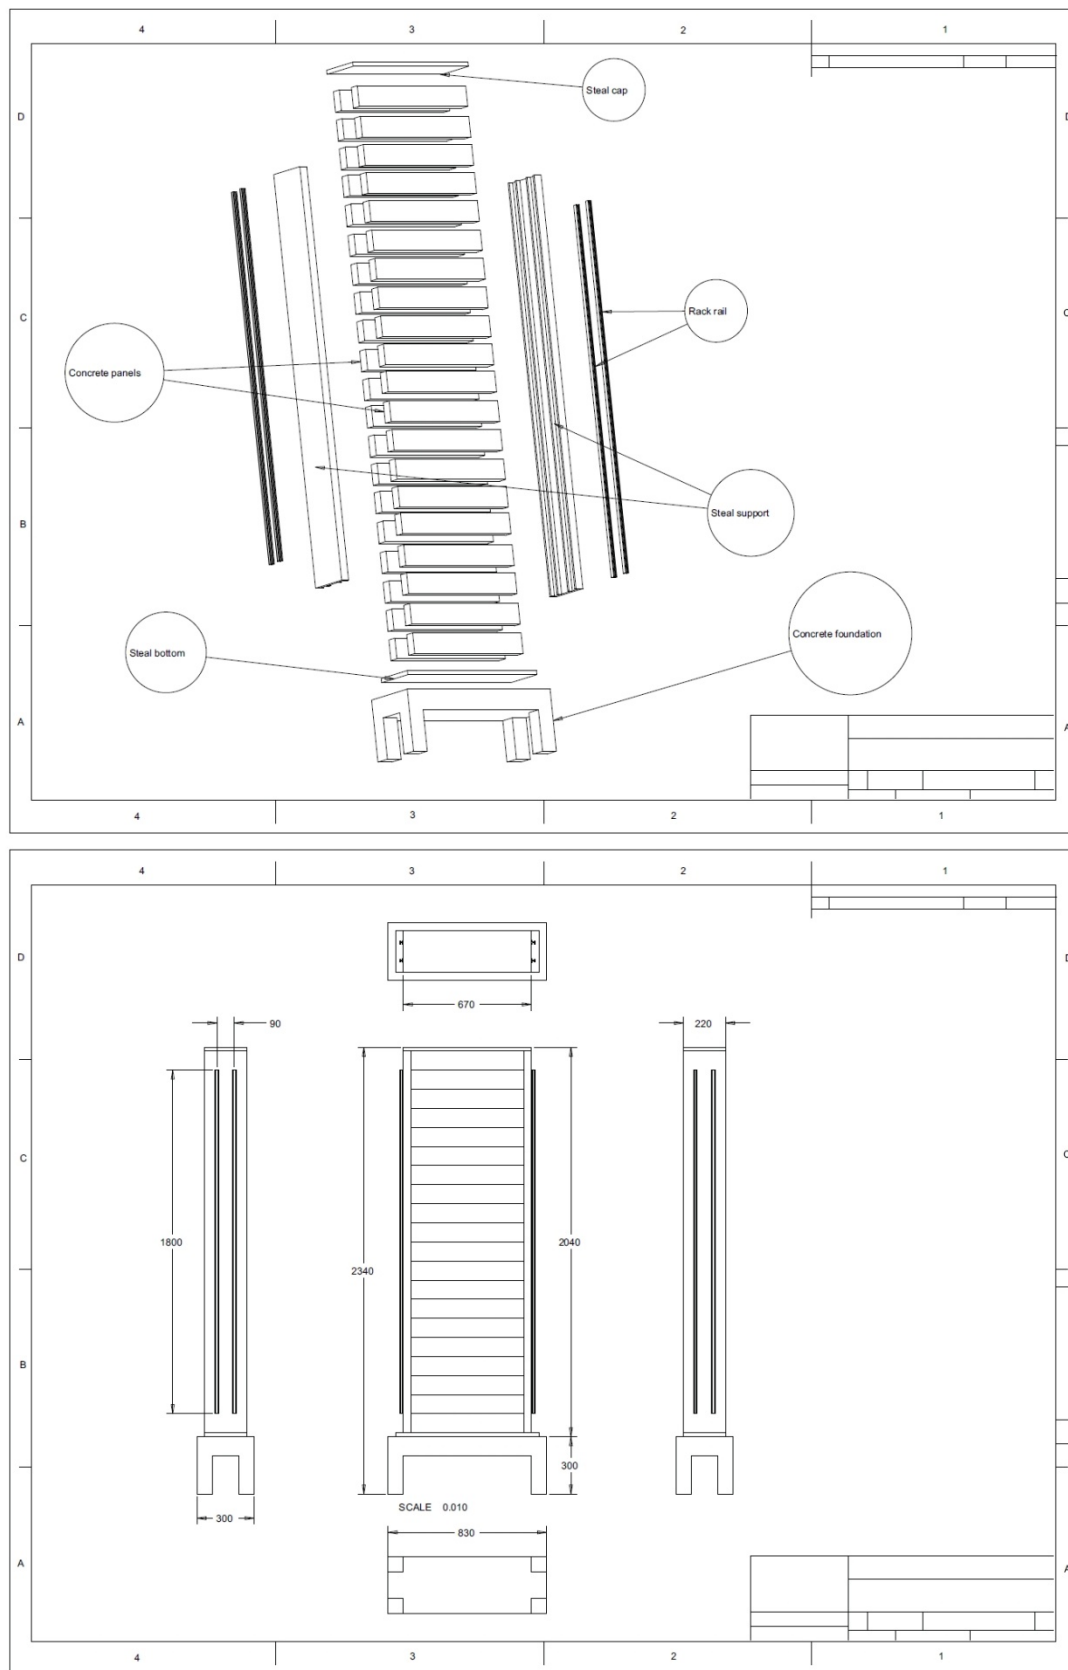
Engineering drawing of BUKU shield. It would take 2 days to construct the shield at Fukushima Daiichi, if all the equipment is provided/available.
